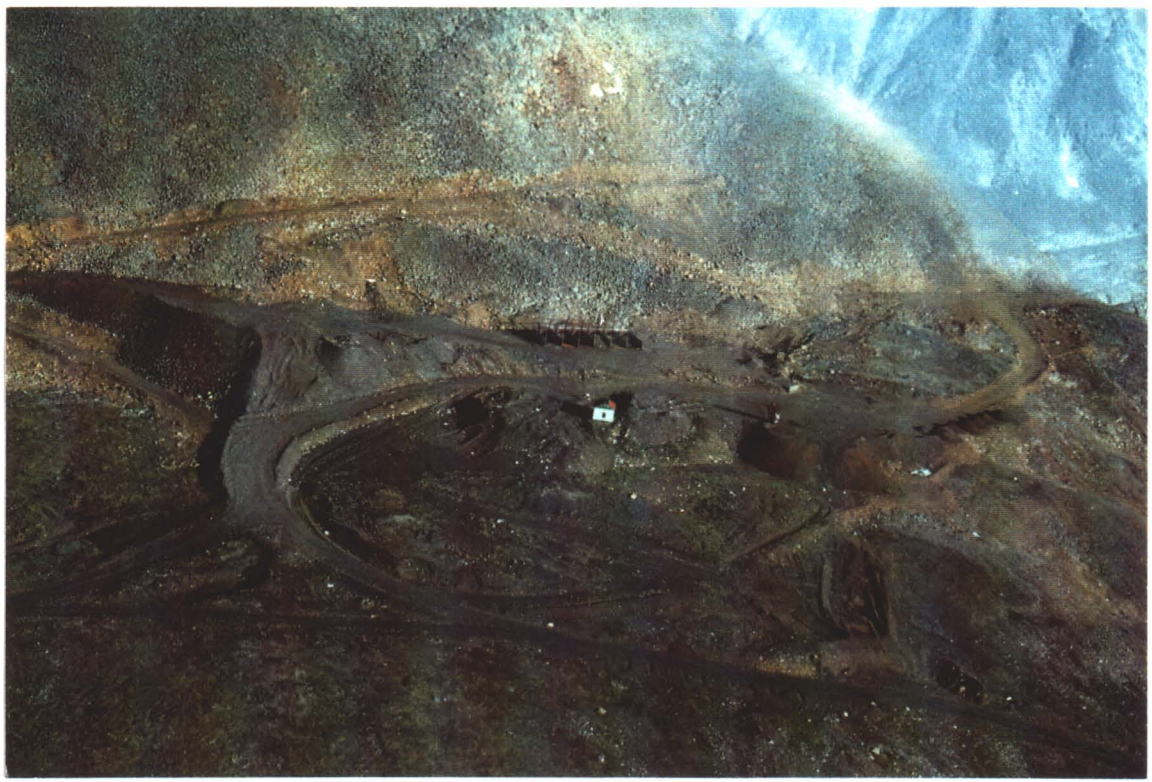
Overview of generator building and ore bins (photo centre), and sample splitter and ore piles (right centre of photo).
